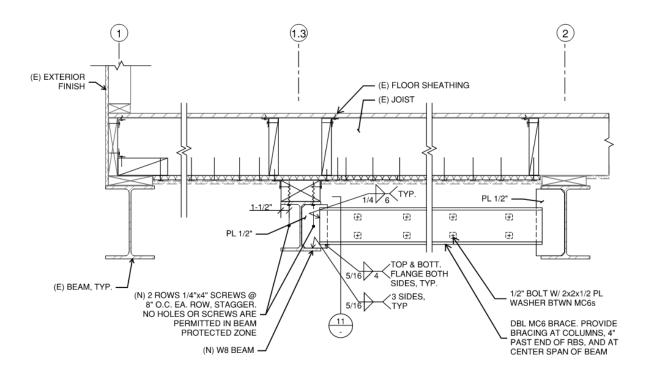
Lateral-torsional bracing of moment frame beam.
